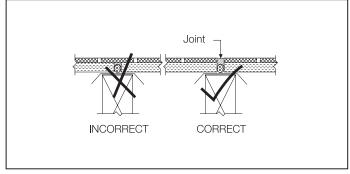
WATER RESISTANT DECK - MOVEMENT JOINTS DETAIL
